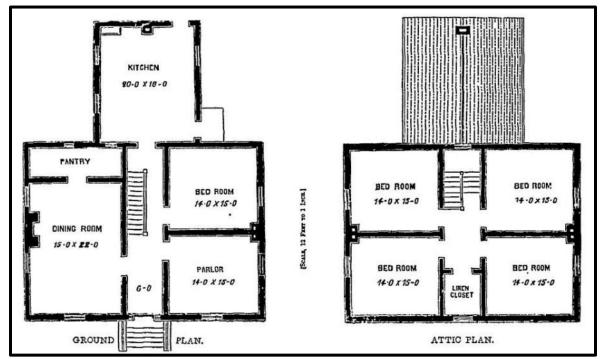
Floor Plans for "A Cheap Farm House" in *The Canada Farmer* (Brown 1864:341)
